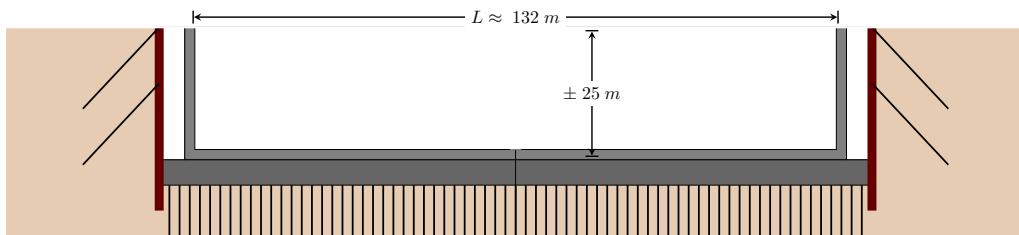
Schematisation of a building pit with an underwater concrete floor and tension piles
